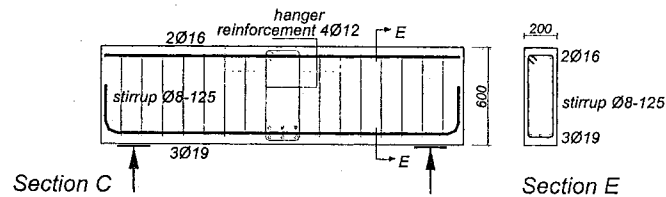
Elevation and section of beam supporting the main beam (Node B)
